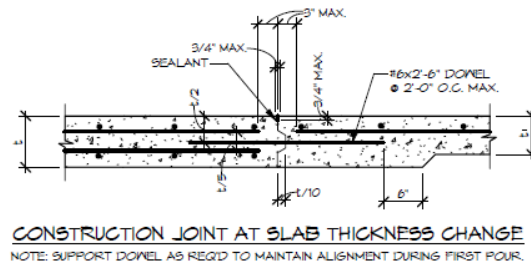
Typical joint when the slab alters its size at the exterior of the building
